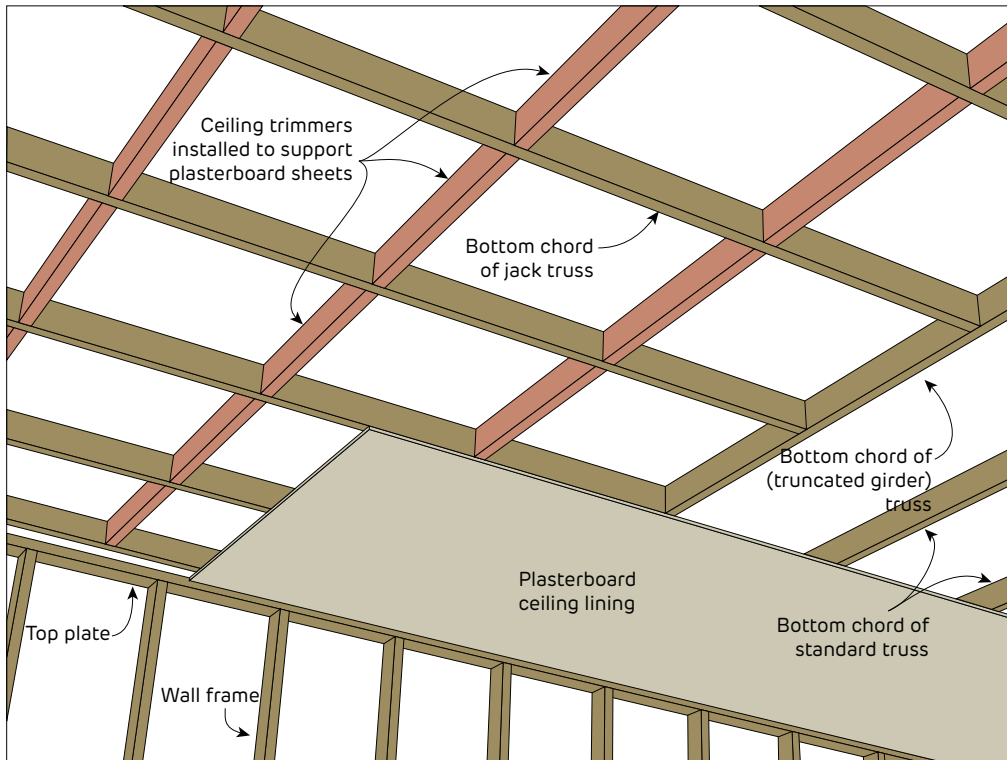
Trimmers to Support Ceiling Lining at Change of Truss Direction
